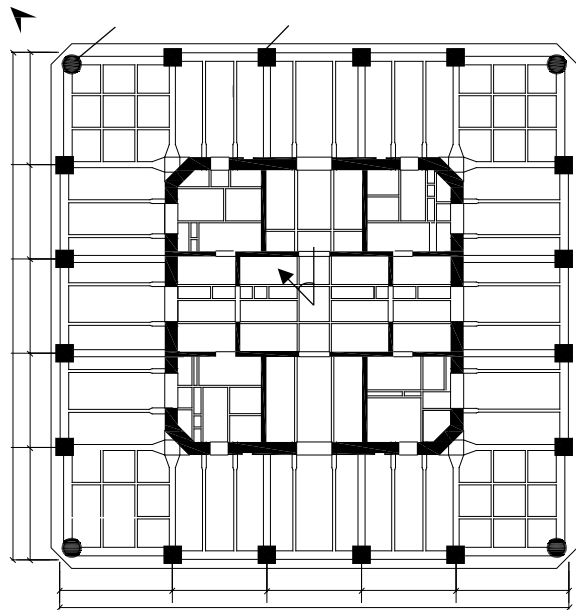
A typical floor of Wuhan Yangtze River Navigation Centre
